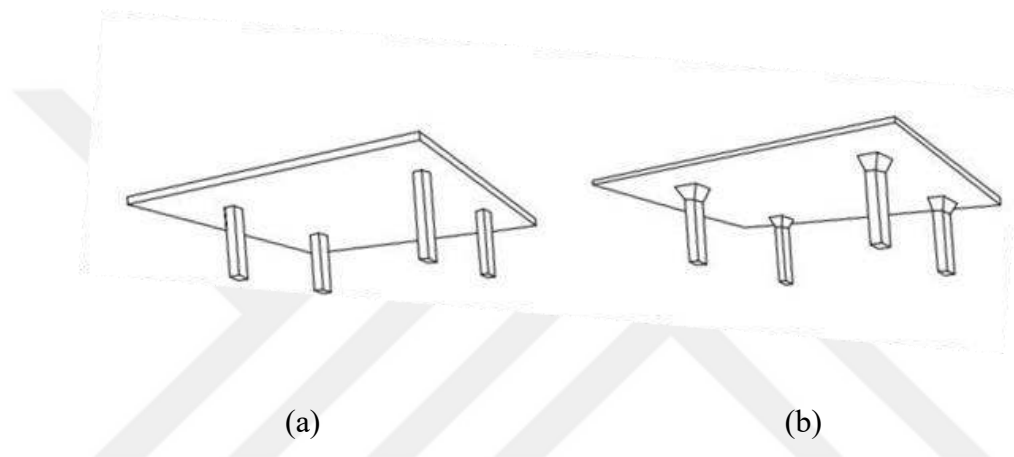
Diagram Showing (a) Flat Slab System without Column Head (b) Flat Slab System with Column Head.
